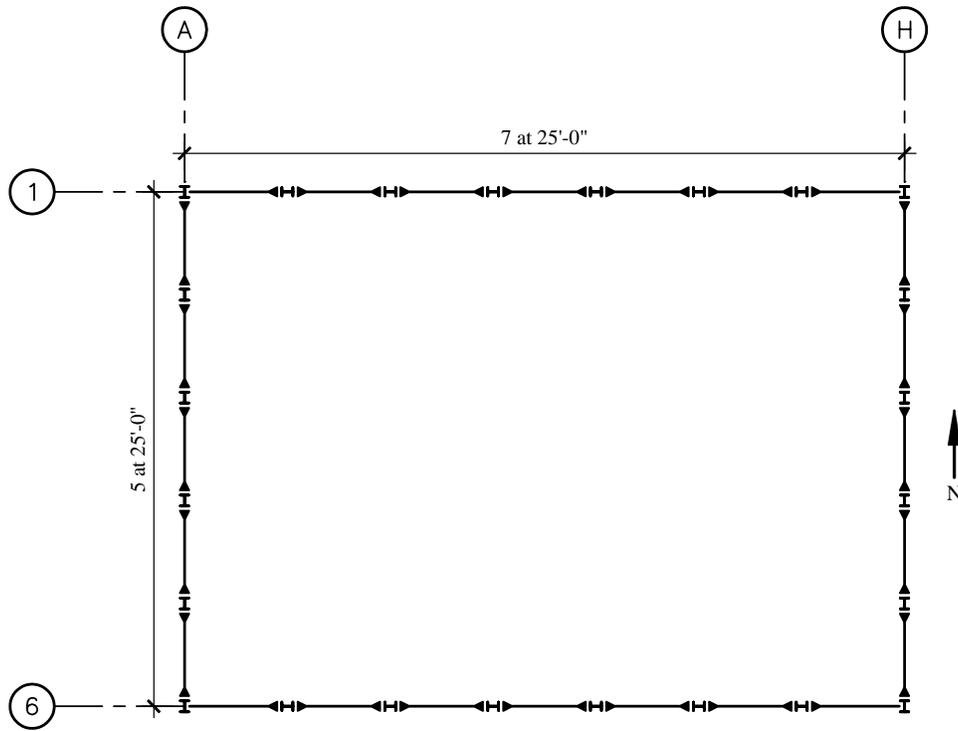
Framing plan for special moment frame (1.0 in. = 25.4 mm, 1.0 ft = 0.3048 m).
